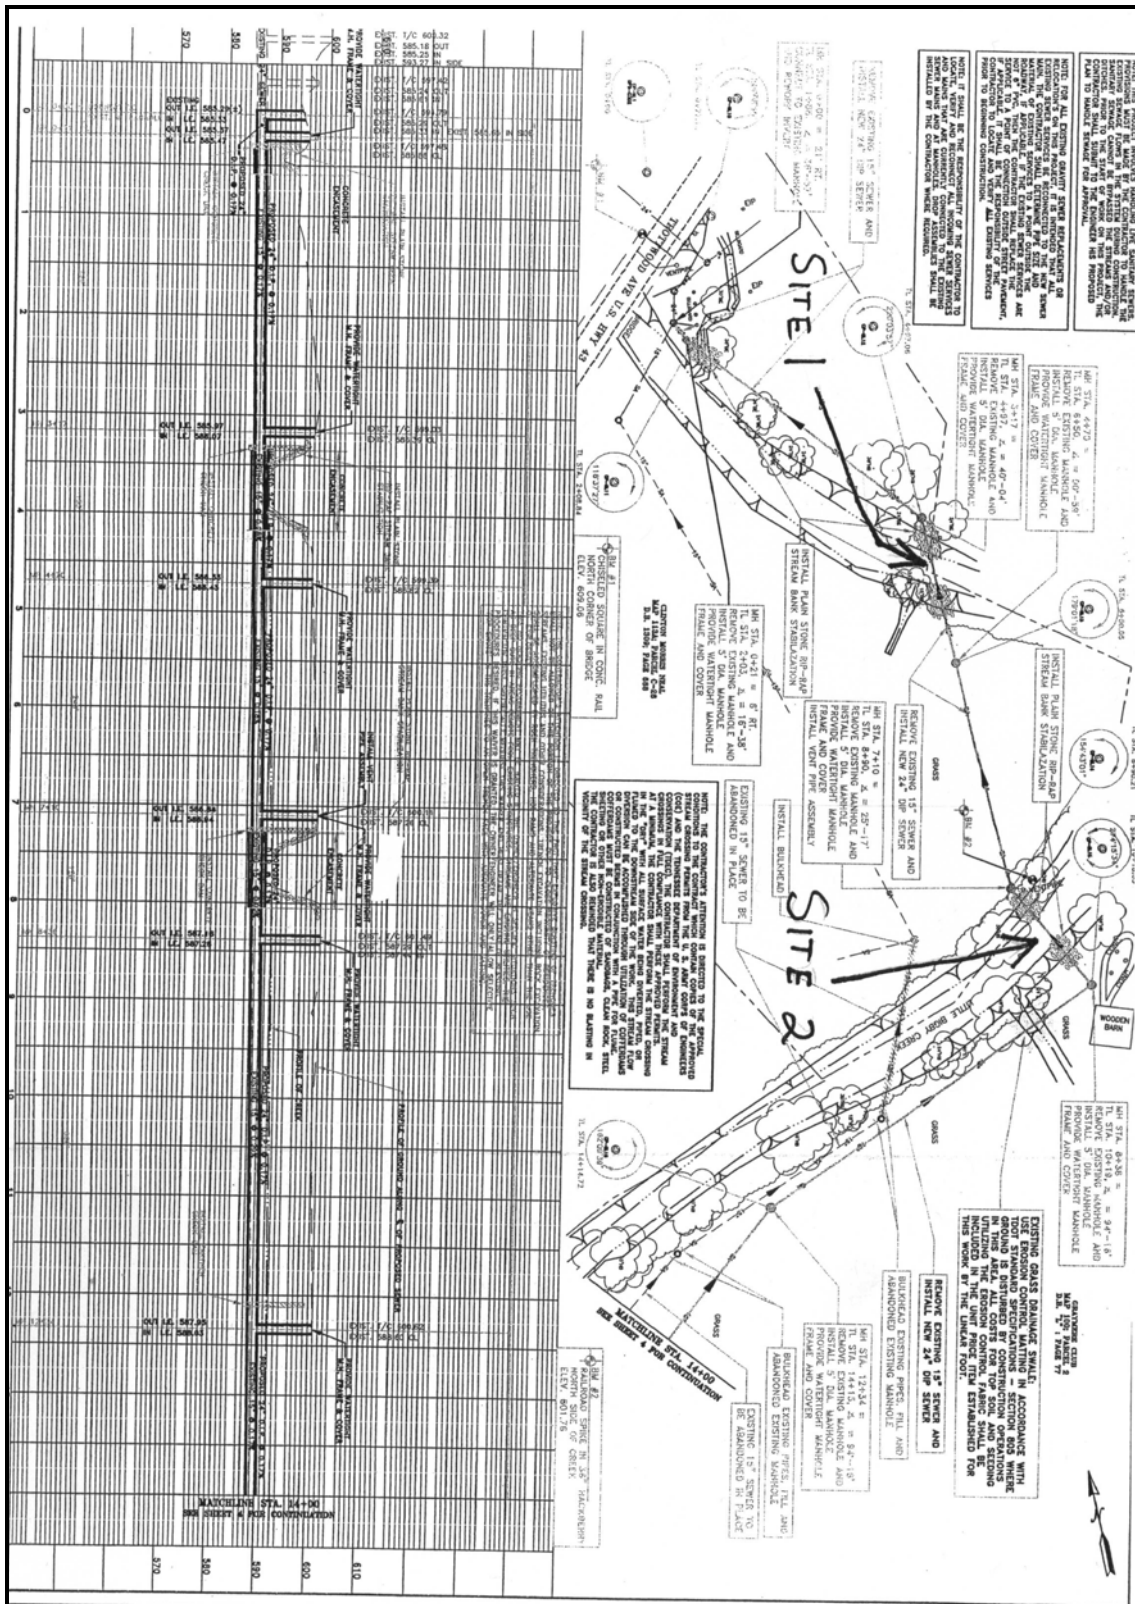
Plan sheet 3, sites 1 and 2 on Little Bigby (replacement crossing)
